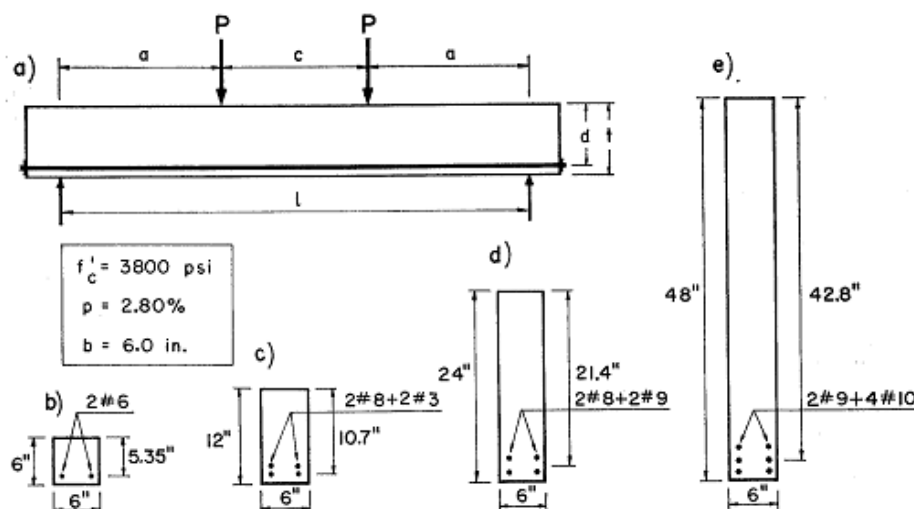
Typical loading arrangement and cross section of beams (Kani 1967).
